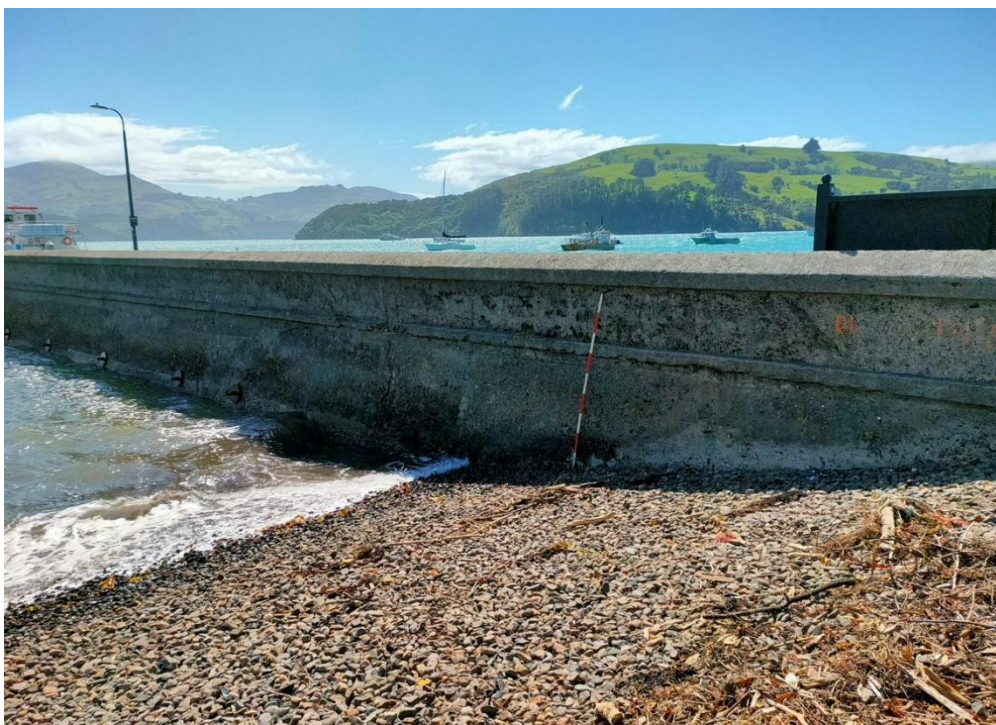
View of south elevation of the concrete abutment of the Akaroa Main Wharf. Visible in the image is the main concrete portion with parrass plates towards its lower portion. The main concrete portion is topped by concrete parapet wall. At the base of the parapet wall is a protruding and extended concrete kerb and the wall is topped by chamfered pier caps. The image is taken looking north. Source: SIA 2021.
